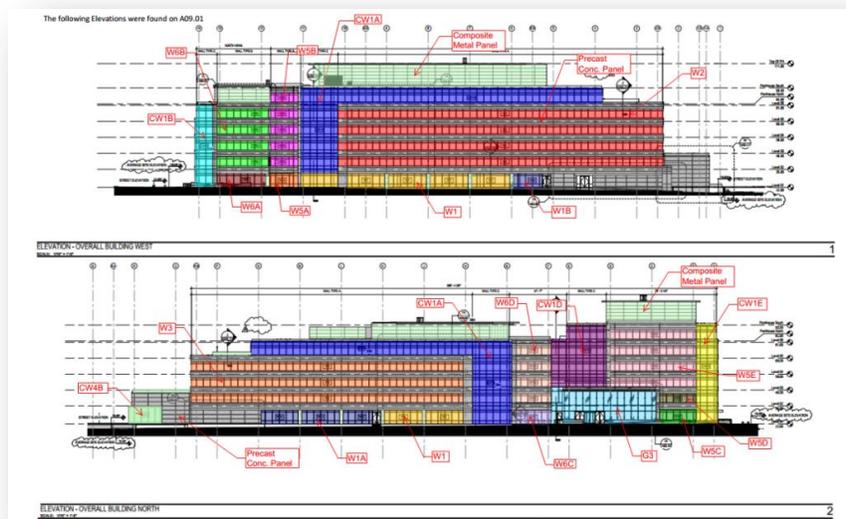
Façade Material Breakdown of West (Top) and North (Bottom) Elevations from sheet A12.02
